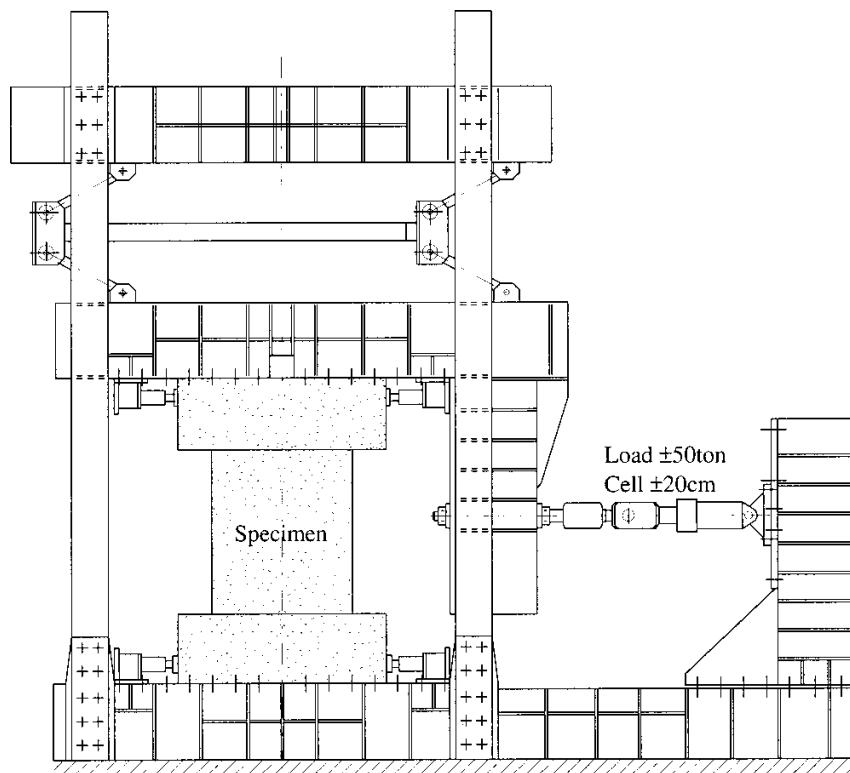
Test Set-Up for Low-Rise Wall Specimens used by Hidalgo et al. (2002)
